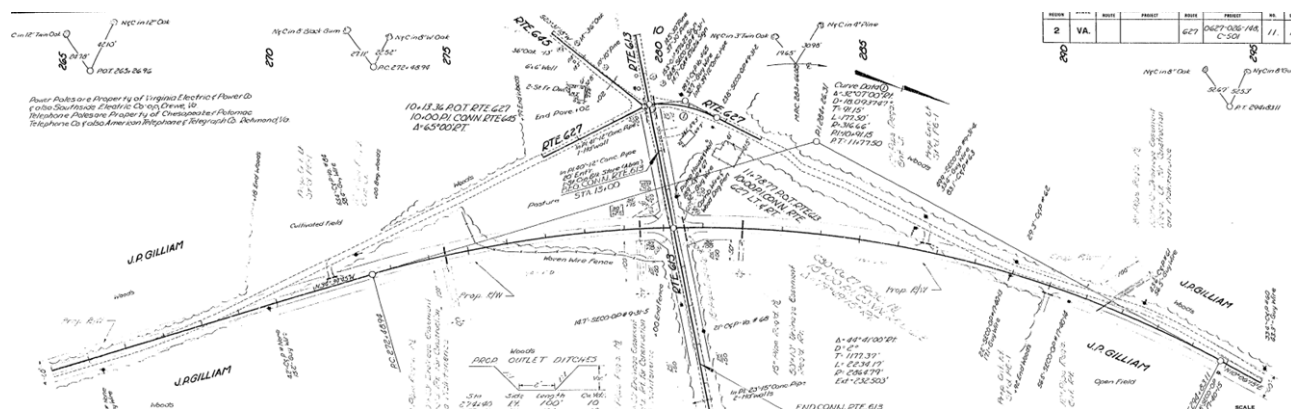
1966 VA State Highway Department plan to realign Route 627 through Five Forks. (Source: VDOT)
